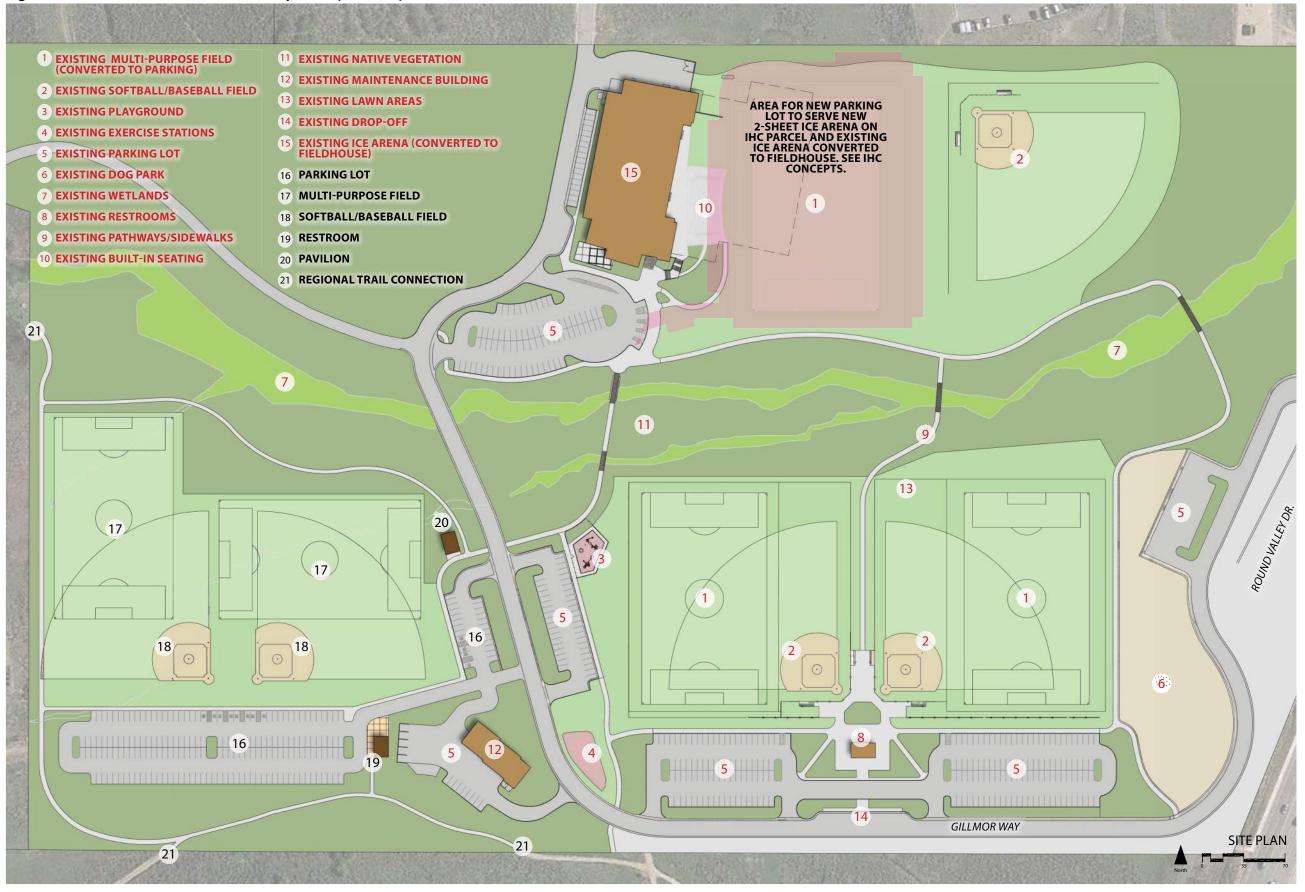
Quinn's Junction - Recommended Concept (Site Plan)
